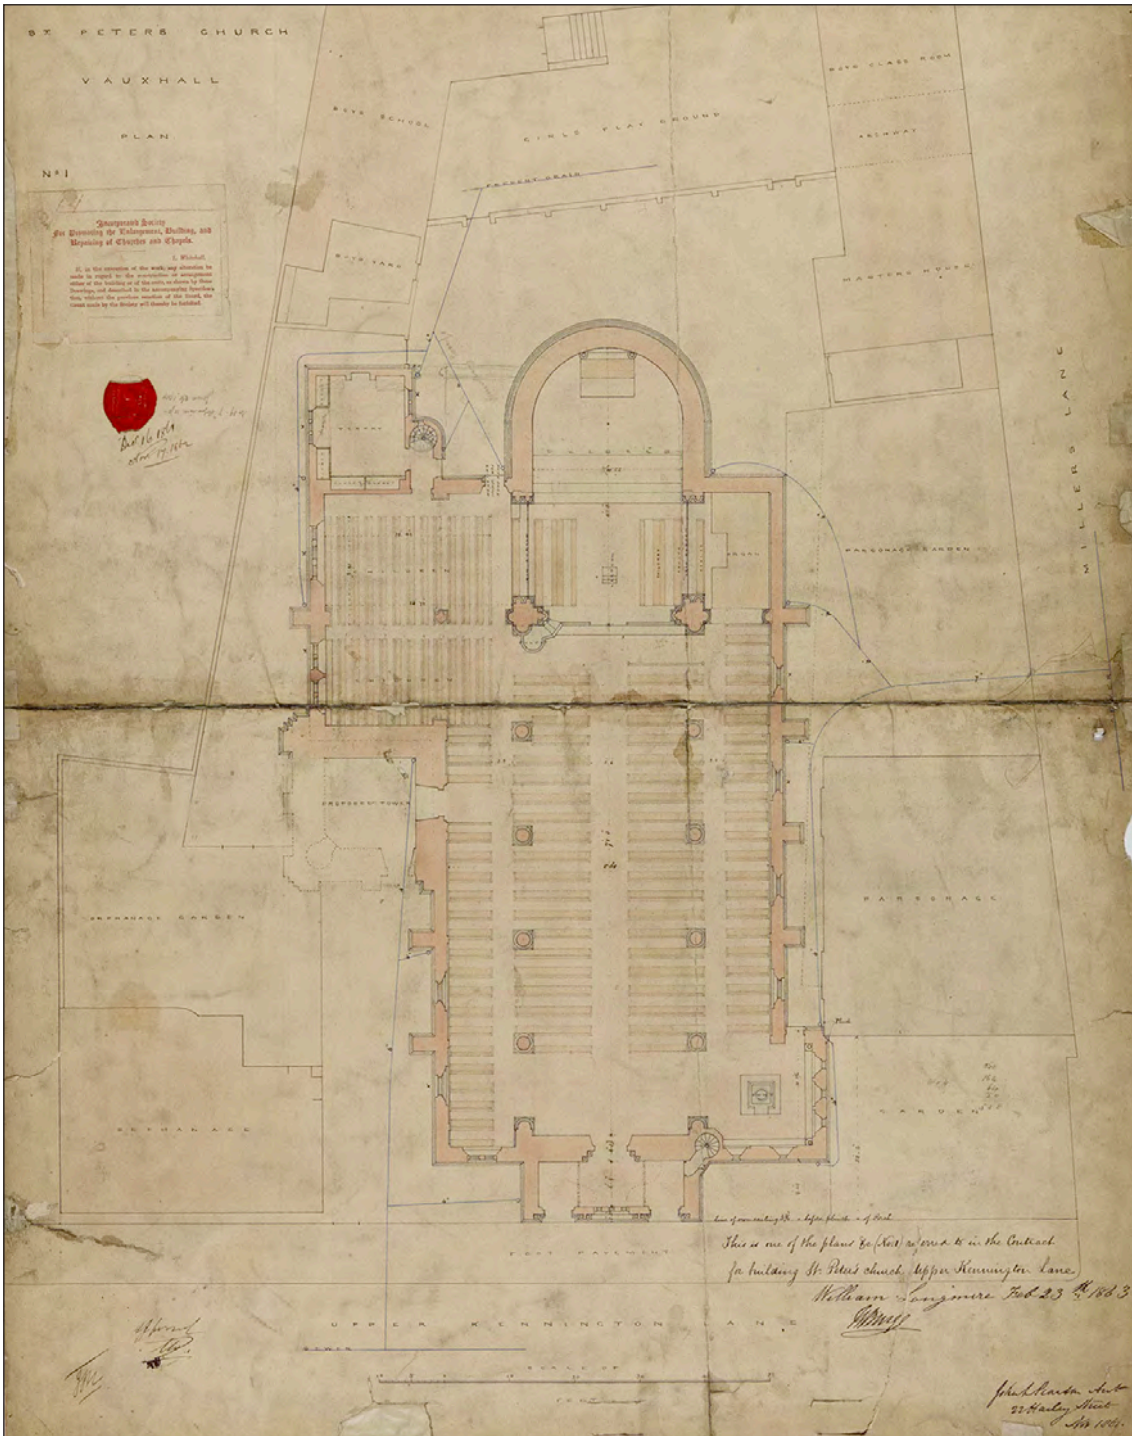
Ground-floor plan of the Church of St Peter, dated 1861 (PB 313/5 8 © RIBA Archive)
